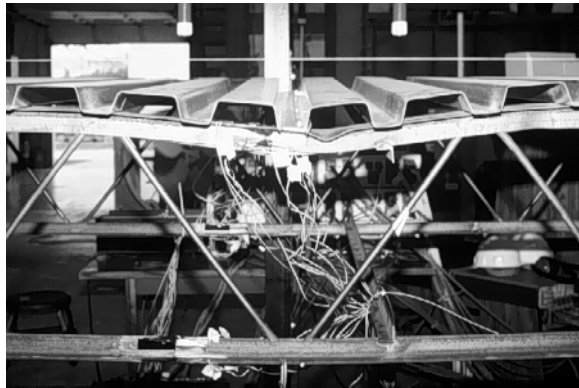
Failure Mode for 16K2-PW-1 East Joist
